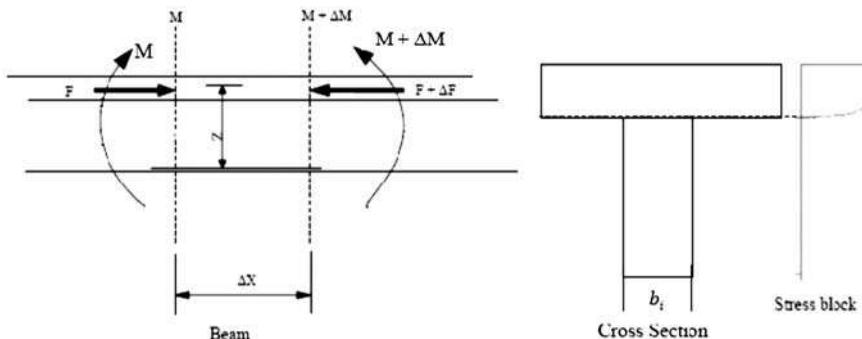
Inter Face Shear between Web and Deck Slab Neutral Axis in Flange
